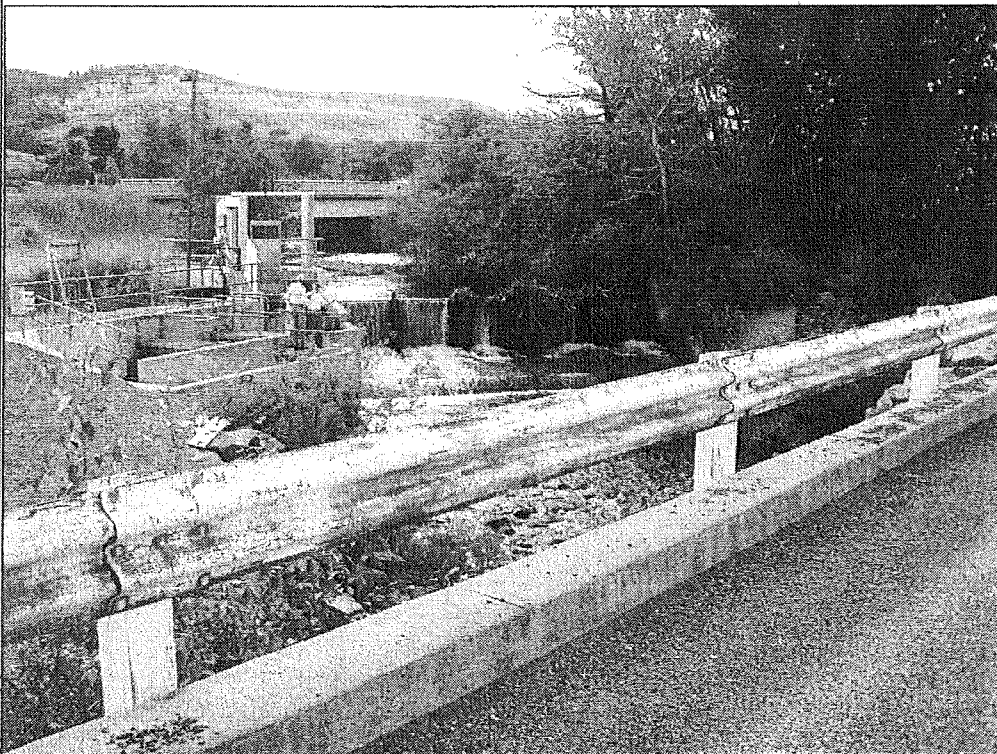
This photo was taken from the Taneum Road bridge, looking upstream at Bruton Dam and associated fish screen and fishway. The westbound bridge of Interstate 90 is also shown, upstream of the Bruton Diversion (about 250 feet from the Taneum Road bridge).
